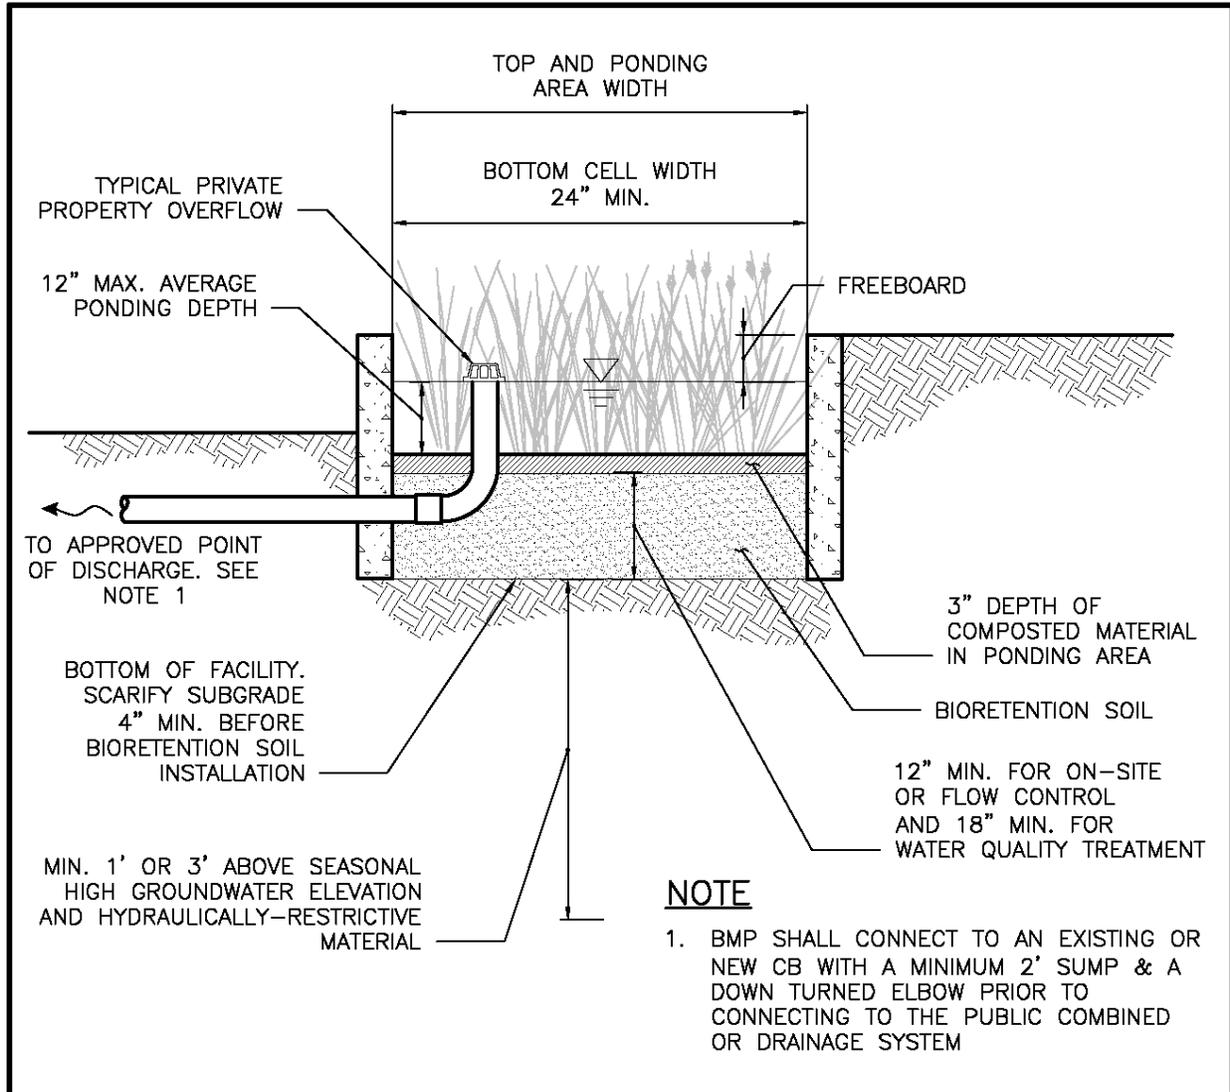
Infiltrating Bioretention Facility with Vertical Sides (without Underdrain).
